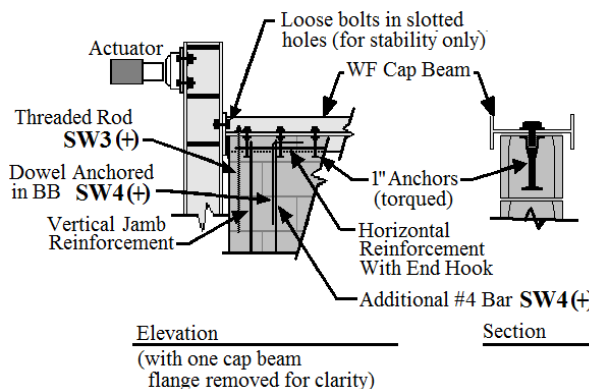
Cap Beam and Reinforcement Anchorage Illustrations
